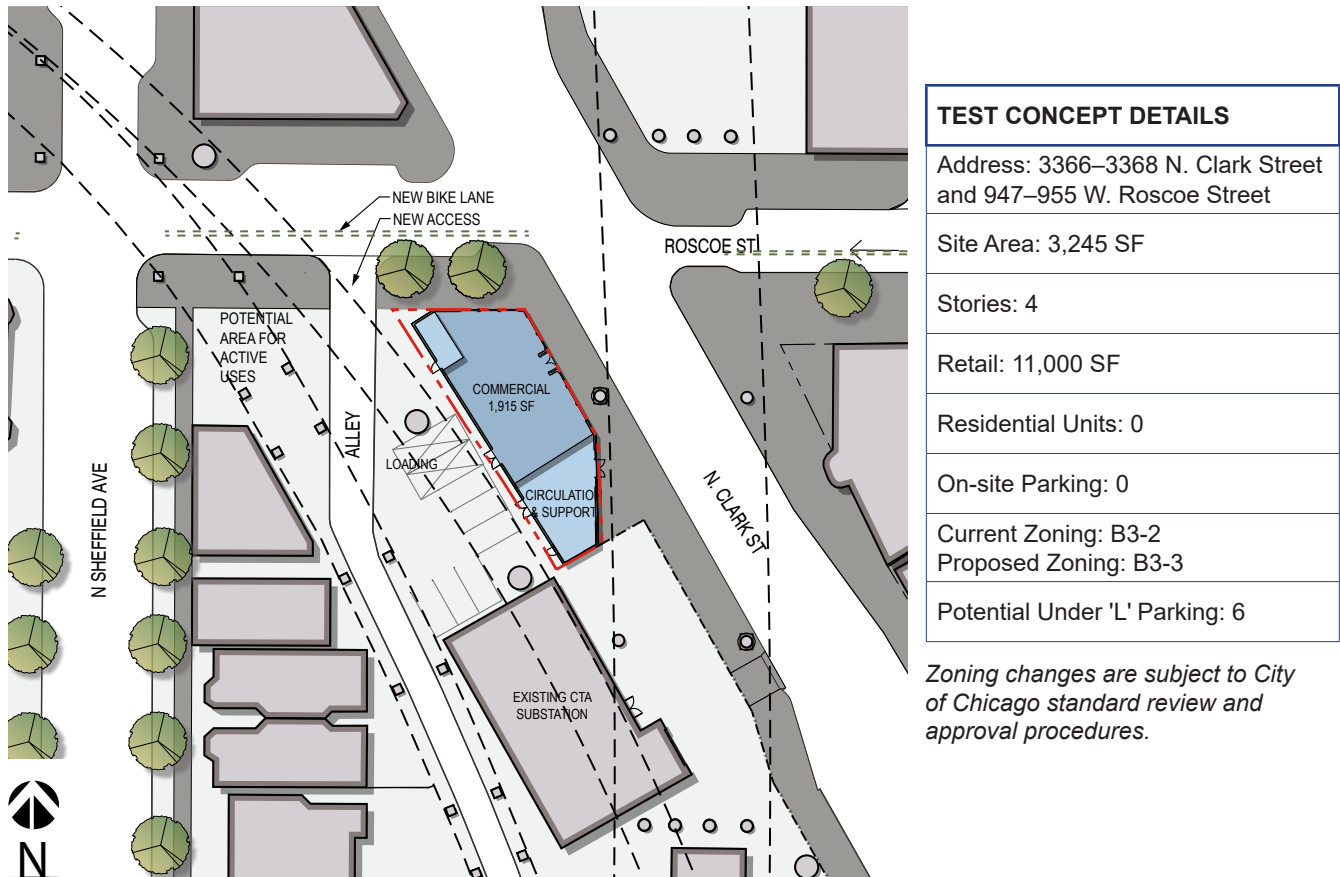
Clark Street and Roscoe Street test concept site plan
